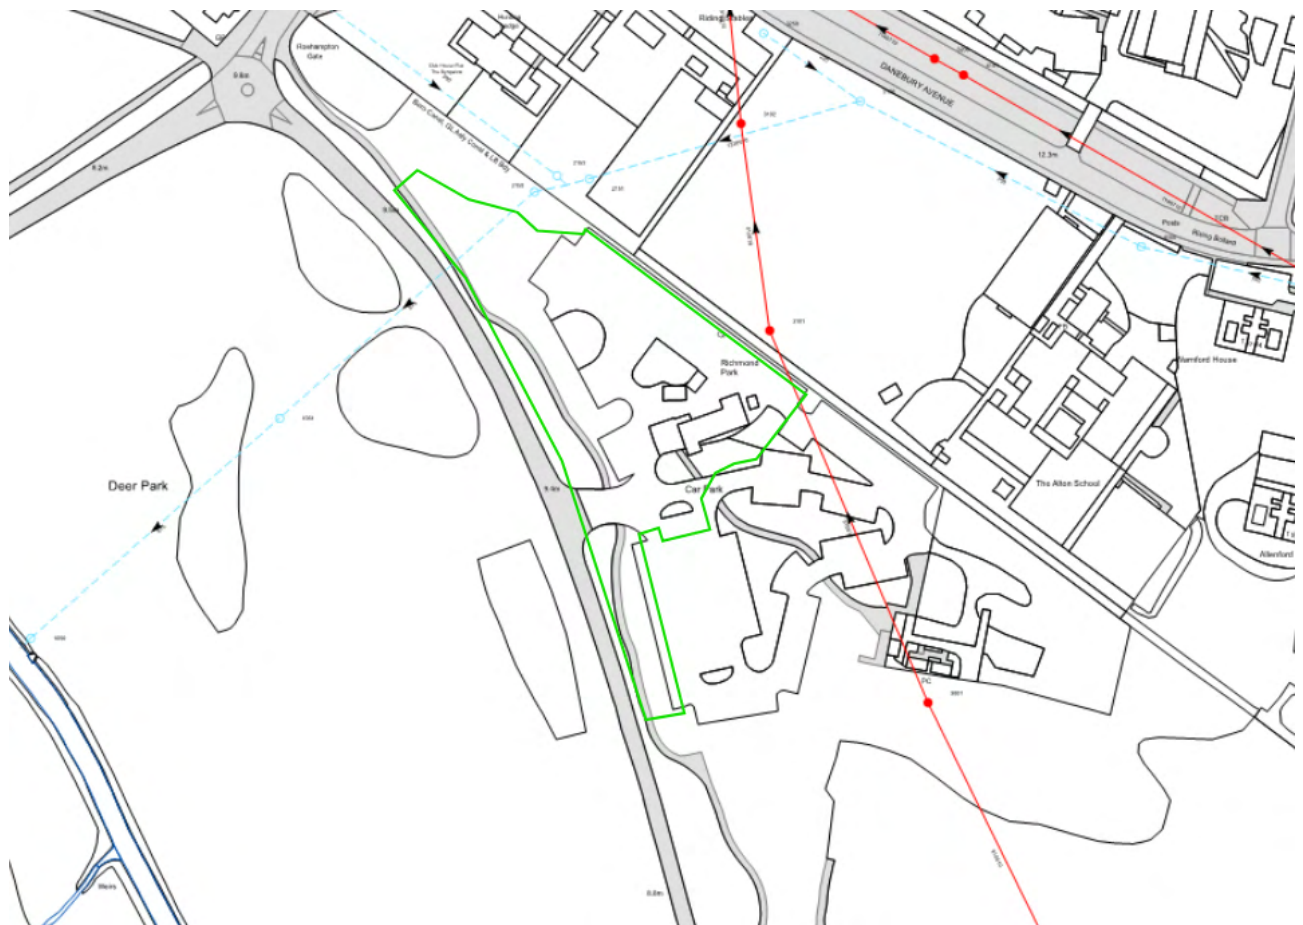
Thames Water sewer records, showing Beverley Brook to the south-west and the site boundary in green
